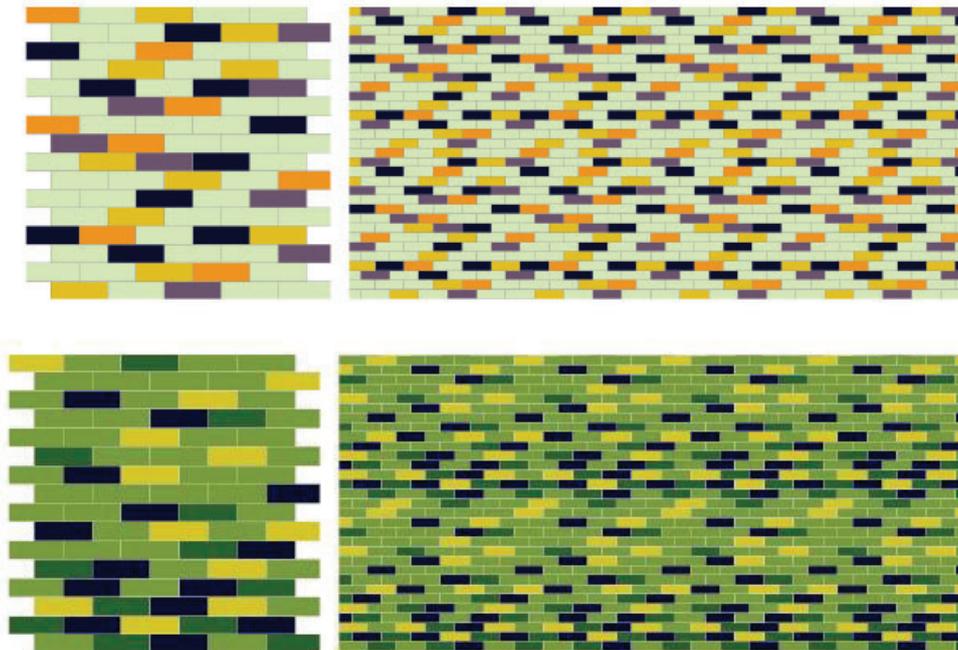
Proposed treatment of walls of underpasses to Platform and Kampman Street (UDLP drawing 16)
